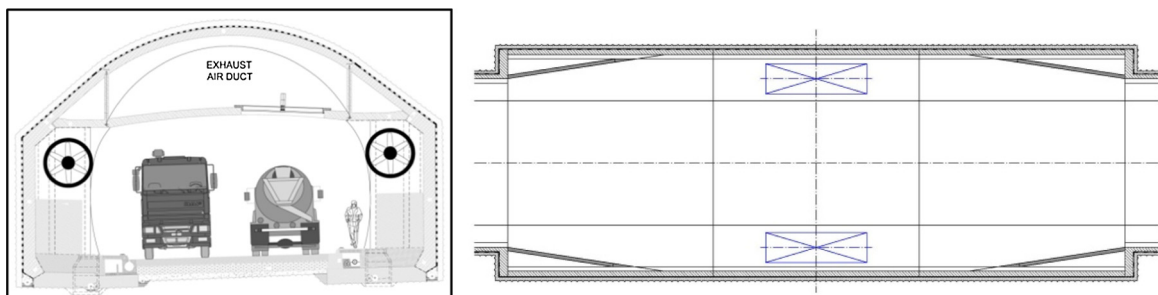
Jet fans in tunnels with transverse ventilation systems for smoke confinement, cross section left, plan view of ventilation niche right [12].
